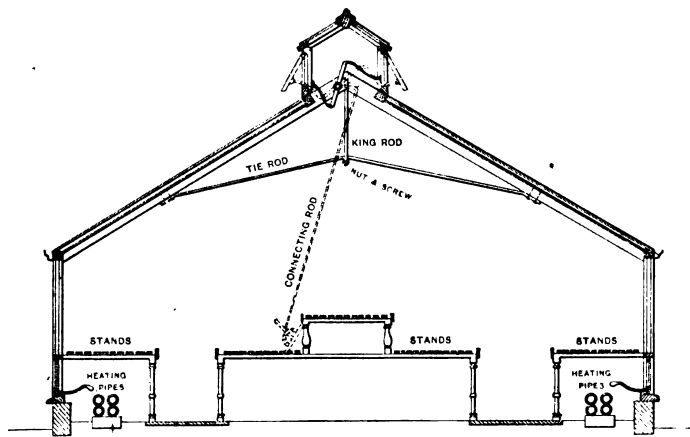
Cross Section Through Building.—Scale, 3-16 Inch to the Foot.
